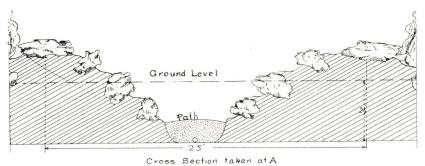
Profile of the rock garden (Fig. 8) showing grades developed upon a level site with soil made available by lowering the elevation of the walk.
